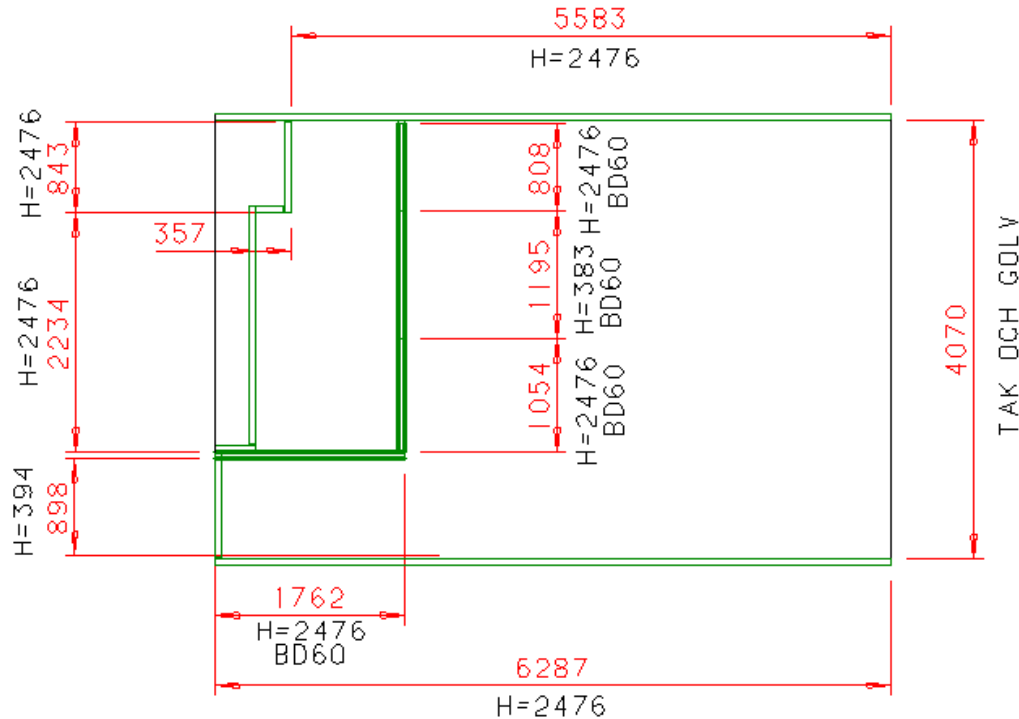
Plan of hotel module, (Oceanic-Creations AB, 2008).
